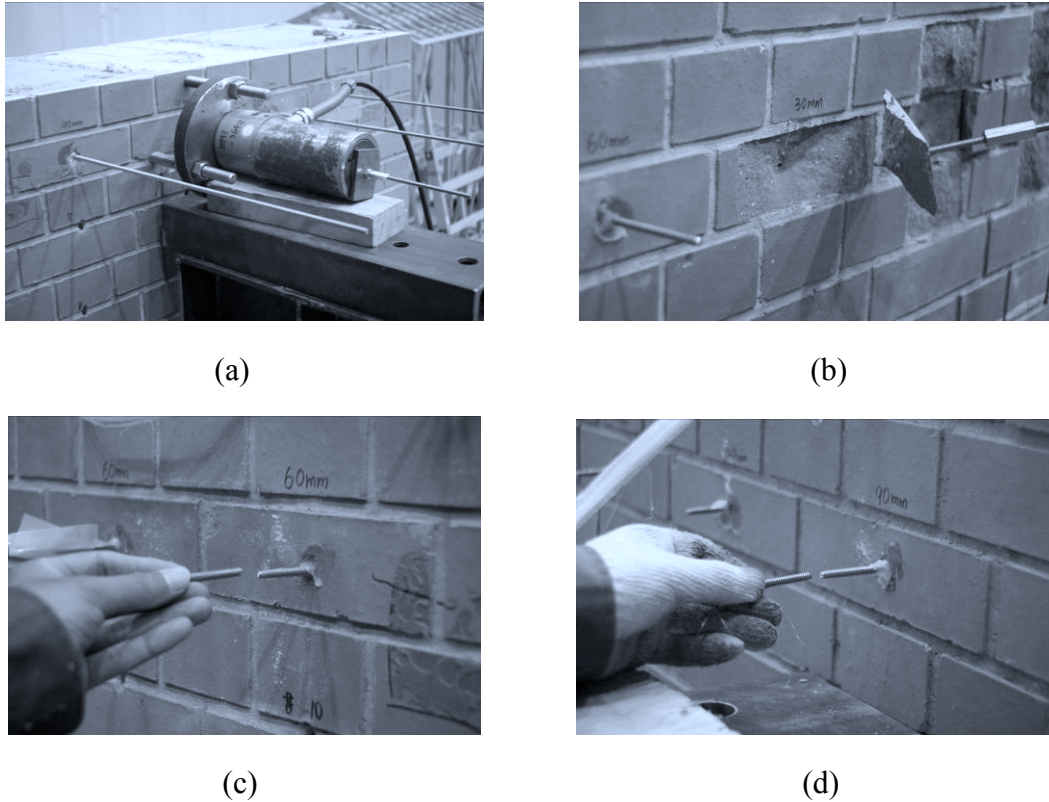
Pull-out test: (a) Test set-up, (b) Brick failure for 30 mm bond length, (c) Pin fracture at 60 mm bond length, (d) Pin fracture at 90 mm bond length.
